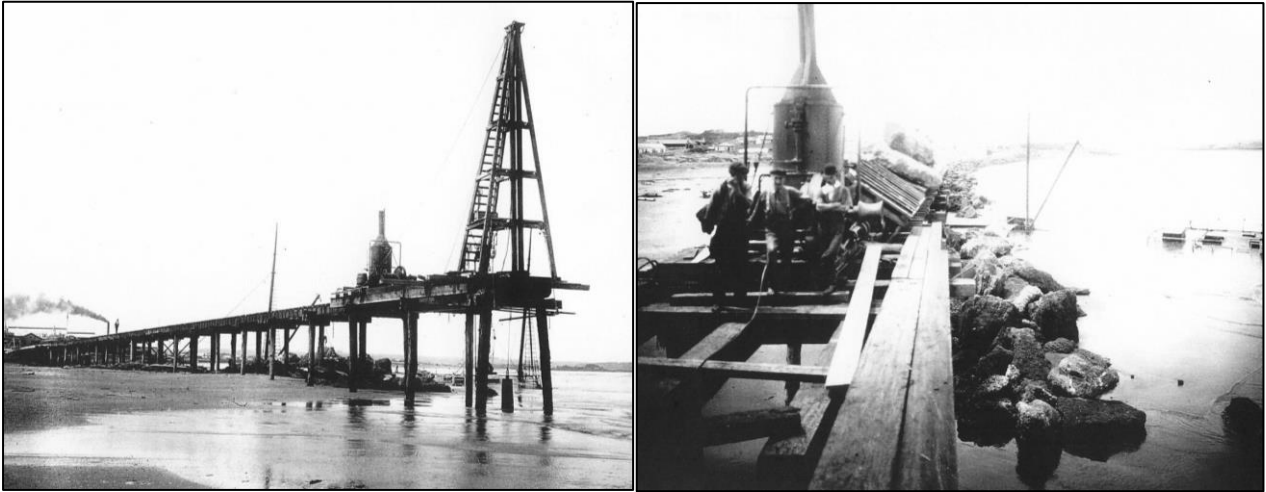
Early Stage 2 construction of North Mole c.1909, showing pile driving and wooden staging (left) and side-tipping stone (right).
